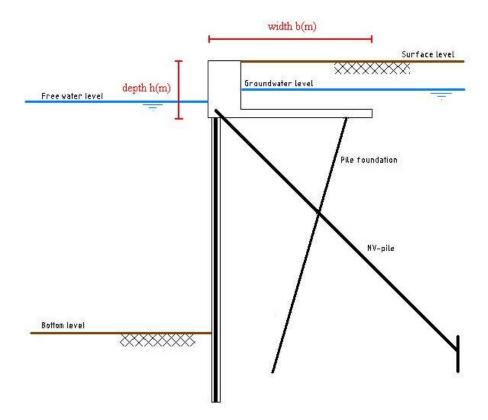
Schematisation of a Quay Wall with a relieving platform
